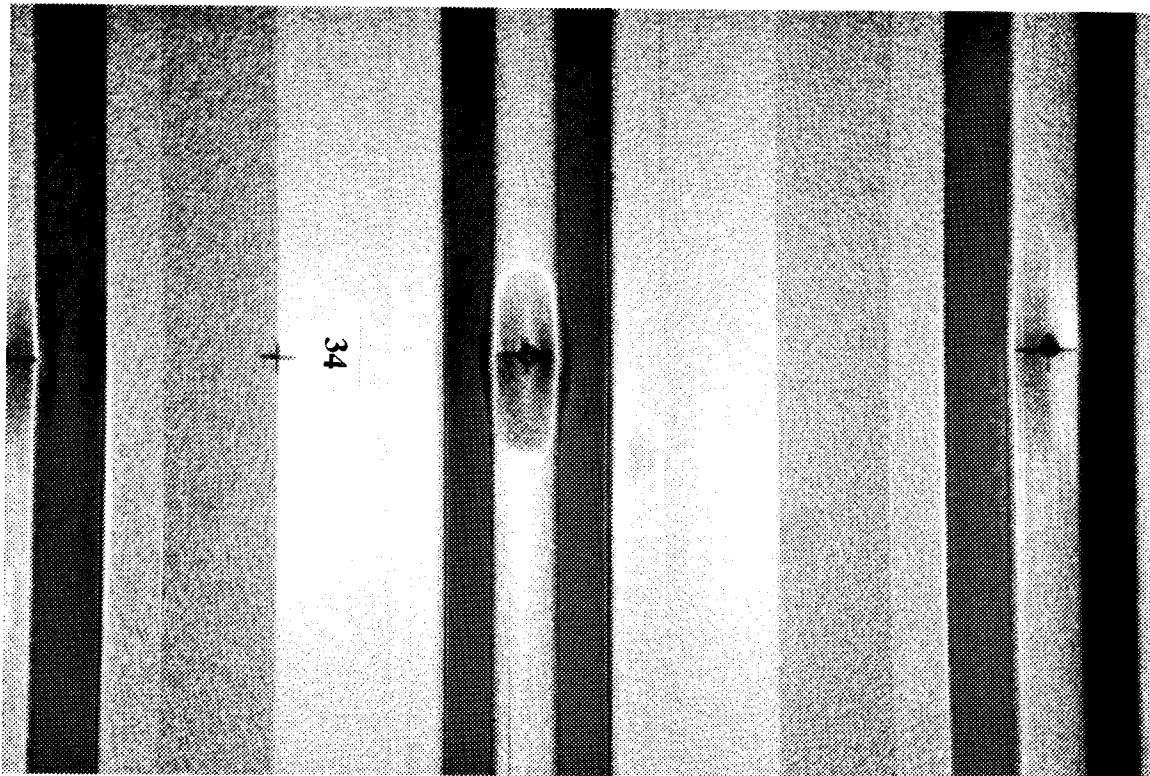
LOCAL PLASTIC DEFORMATION OF RIBBED TYPE ROOFING SHEET
